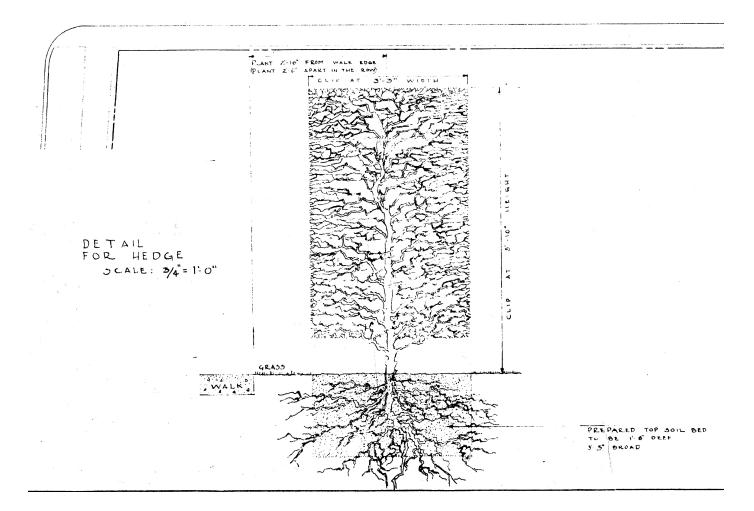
"Detail for Hedge" from the Sheet P-1, Planting Plan showing the Hawthorne hedge treatment.
